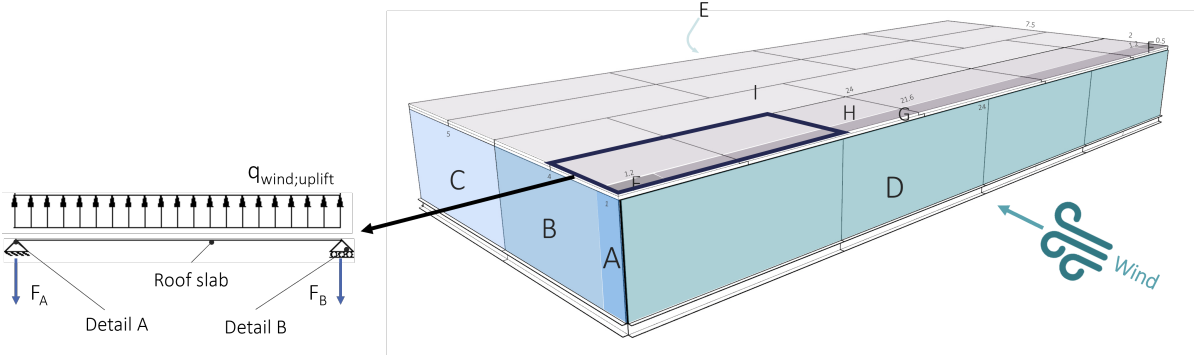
Uplift wind transfer: from roof to detail A to detail F
